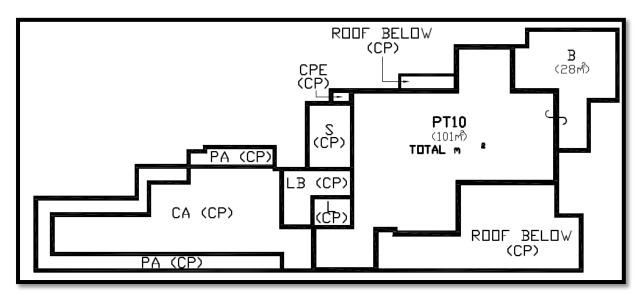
Extract of the proposed third floor strata subdivision, dated 21/04/2021.
